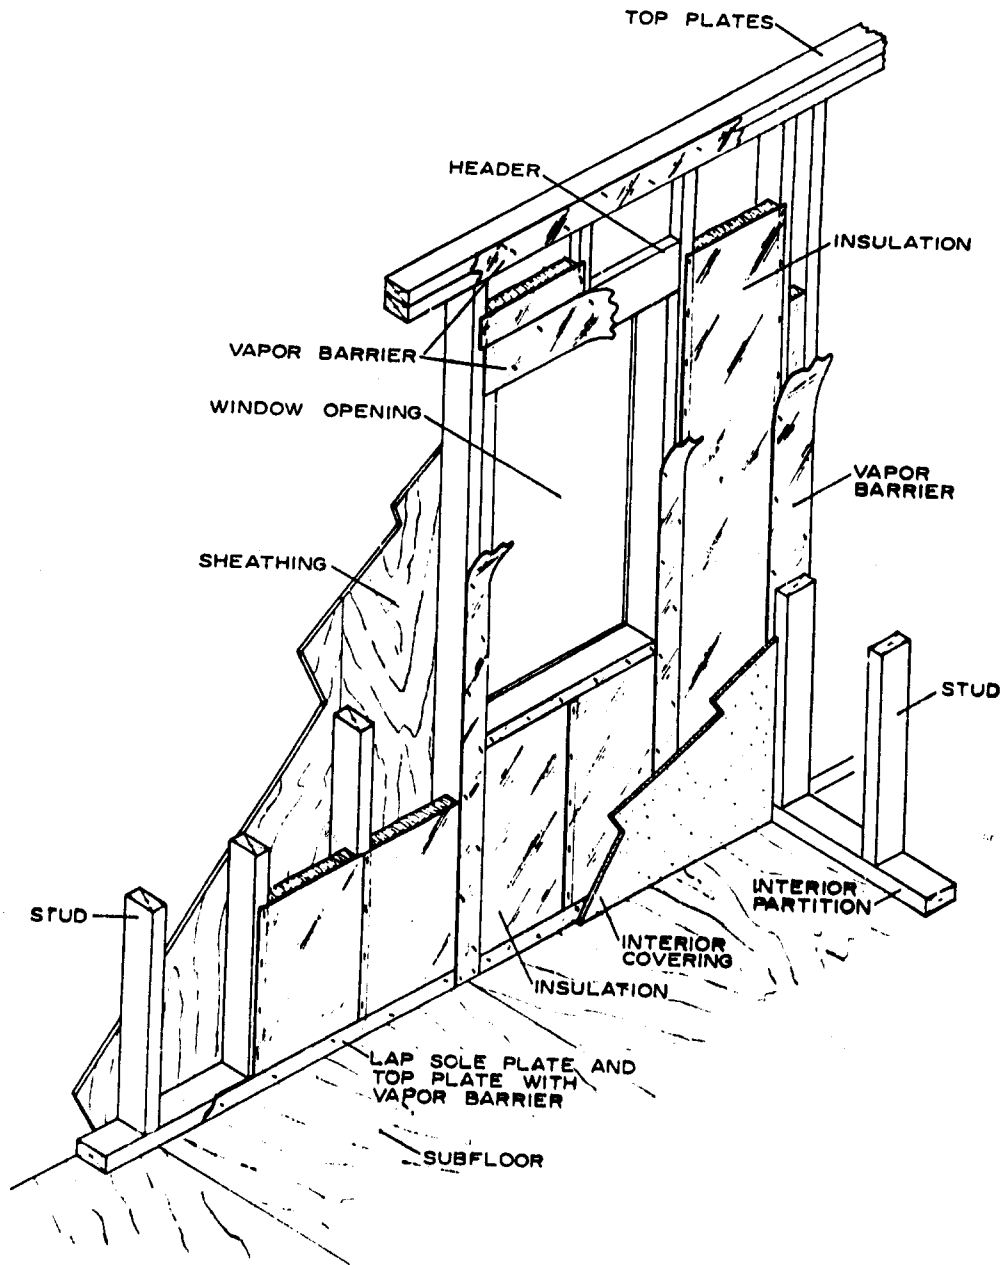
Installing blanket insulation and vapor barriers in exterior wall. M 139 219
